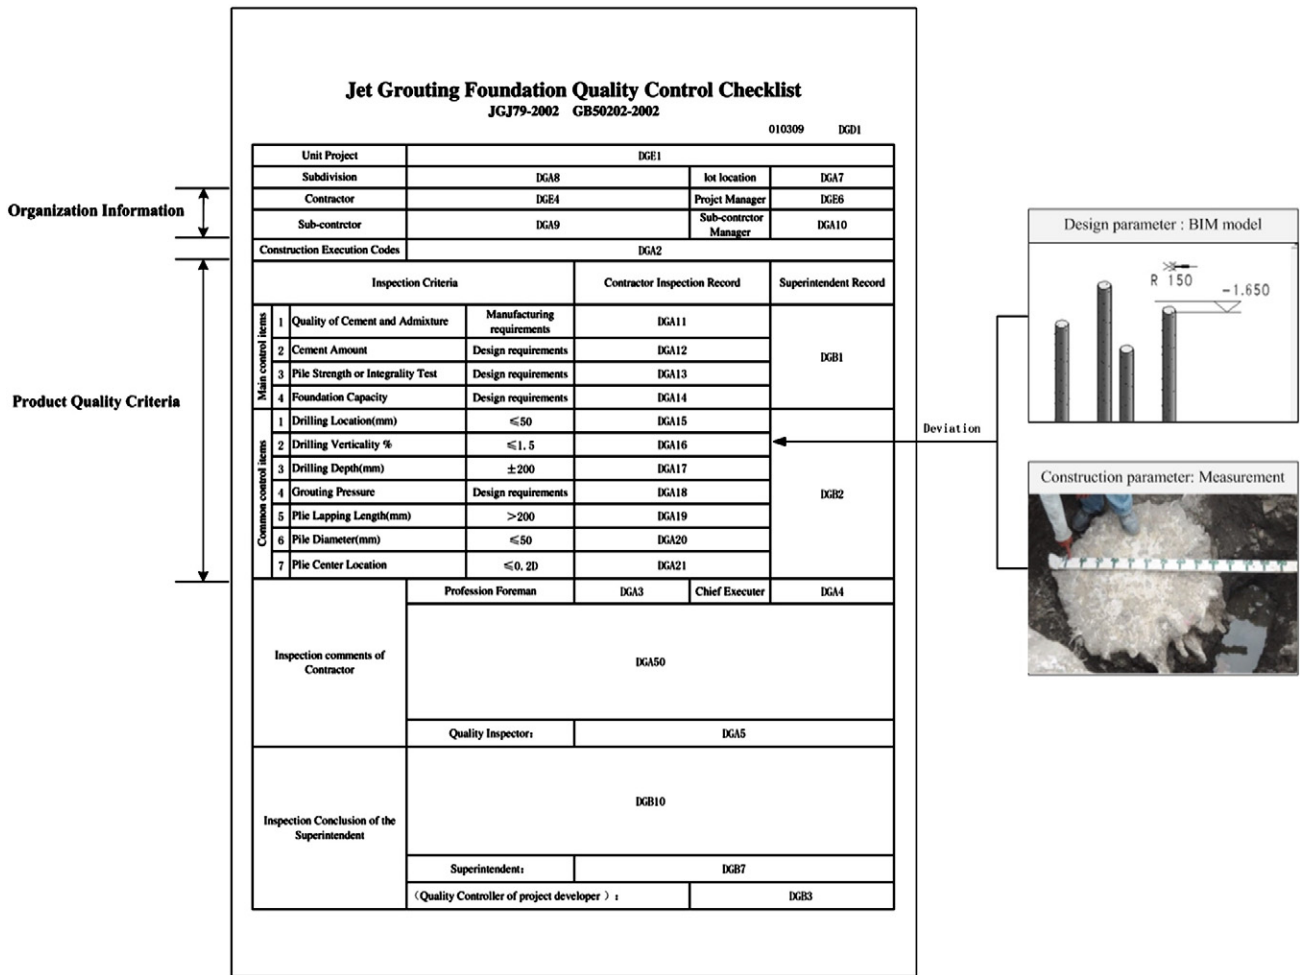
Quality inspection checklist for jet grouting foundation.
